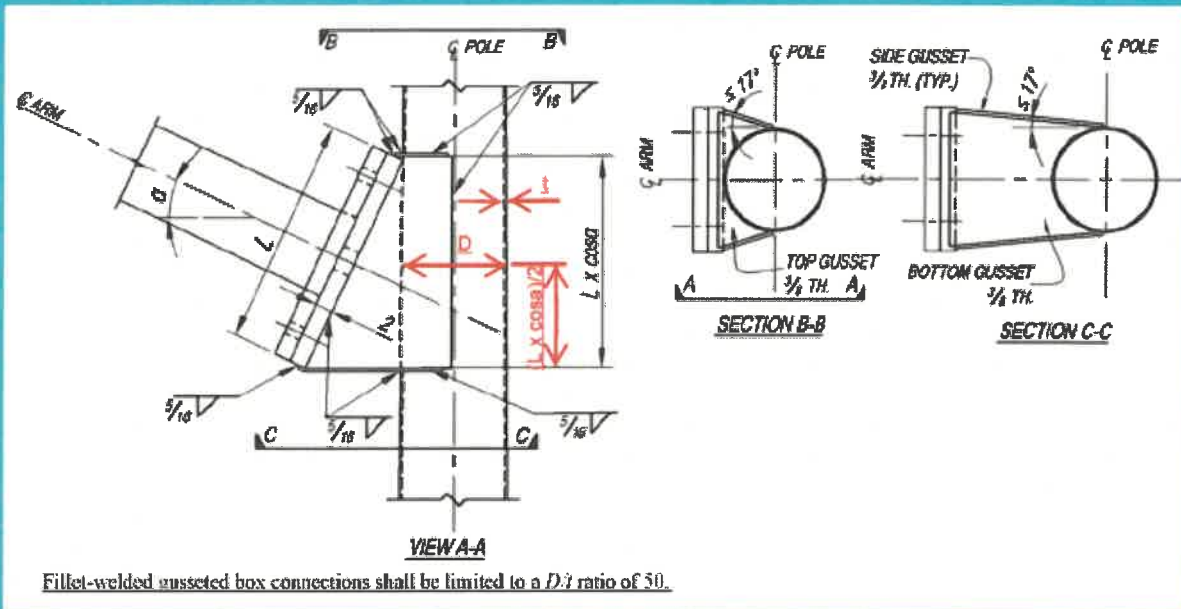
Details of Fillet-Welded Gusseted Box Connections
